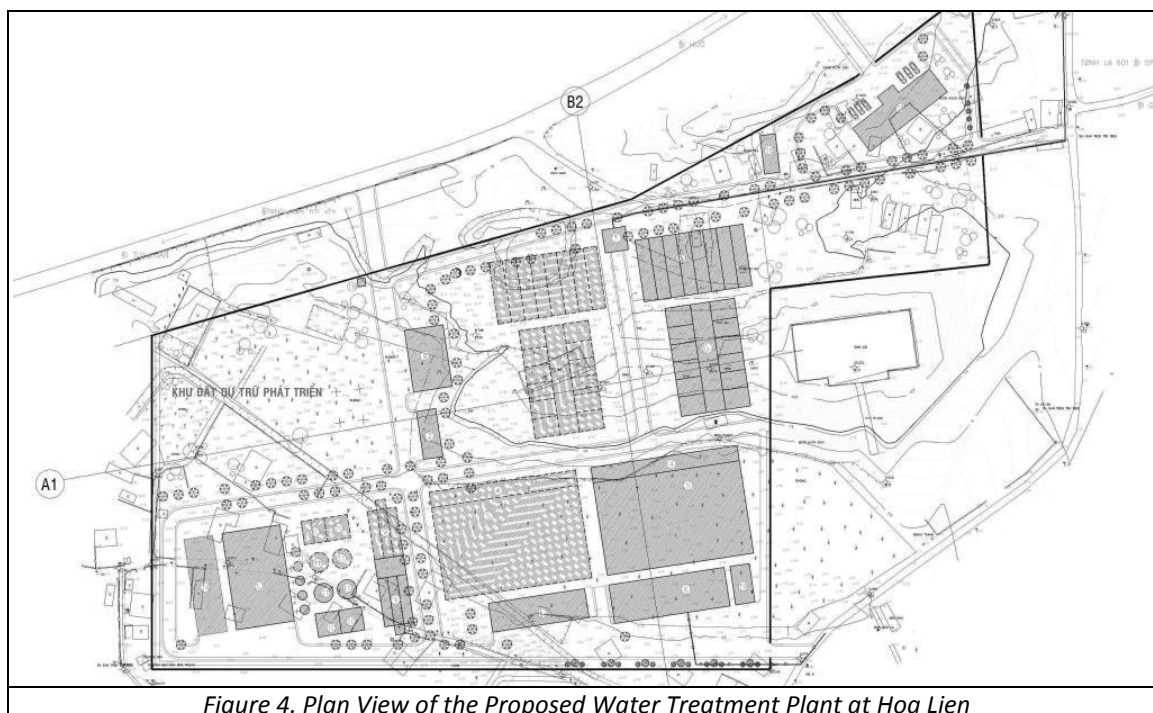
Plan View of the Proposed Water Treatment Plant at Hoa Lien
